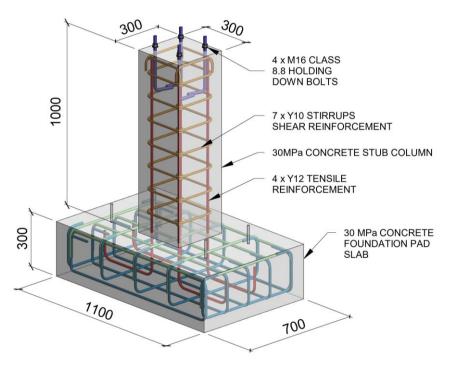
Three-dimensional visualisation of the reinforced concrete footing (Units in mm)
